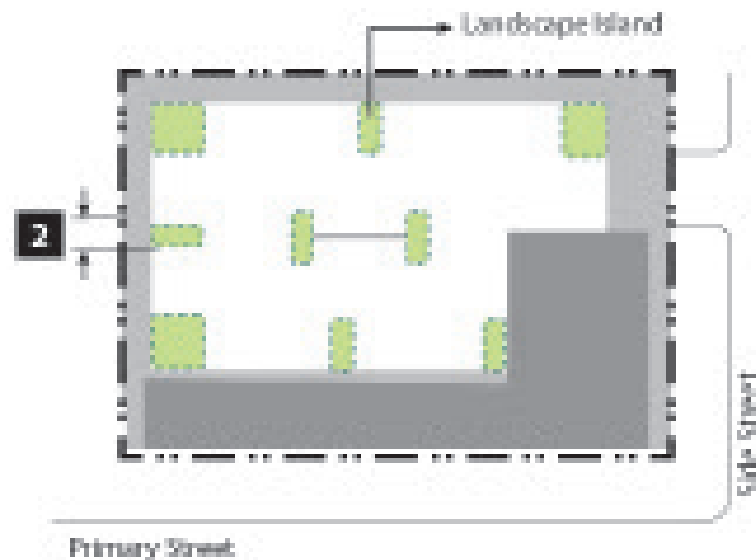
Parking lot interior landscaping diagram. Not to scale.
